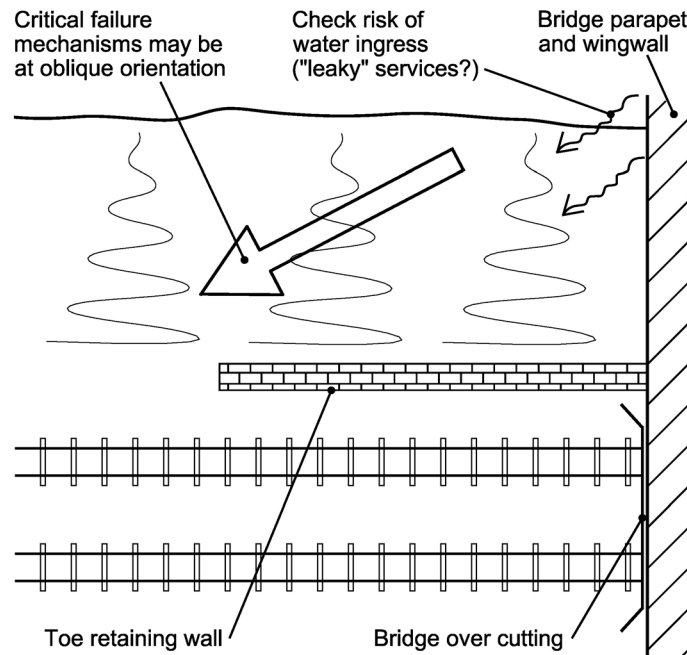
Retaining Walls, adjacent to Bridge (Plan View)
